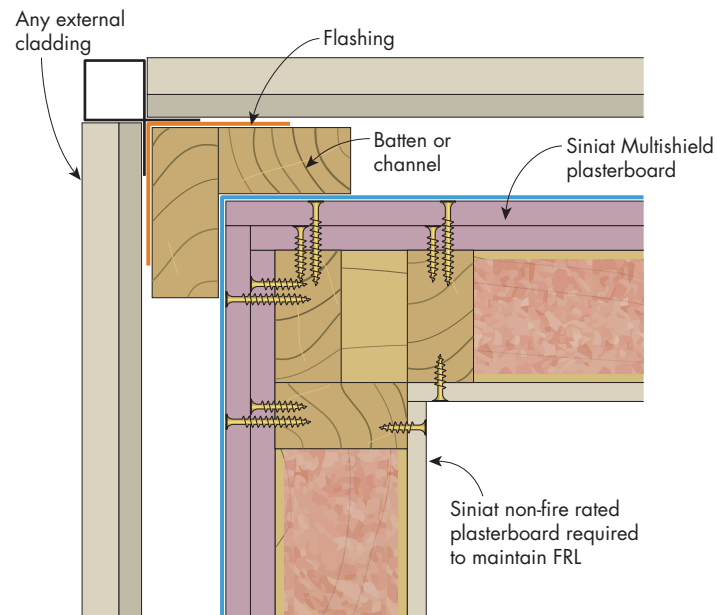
External Timber Wall to Non-combustible Roof Lining
